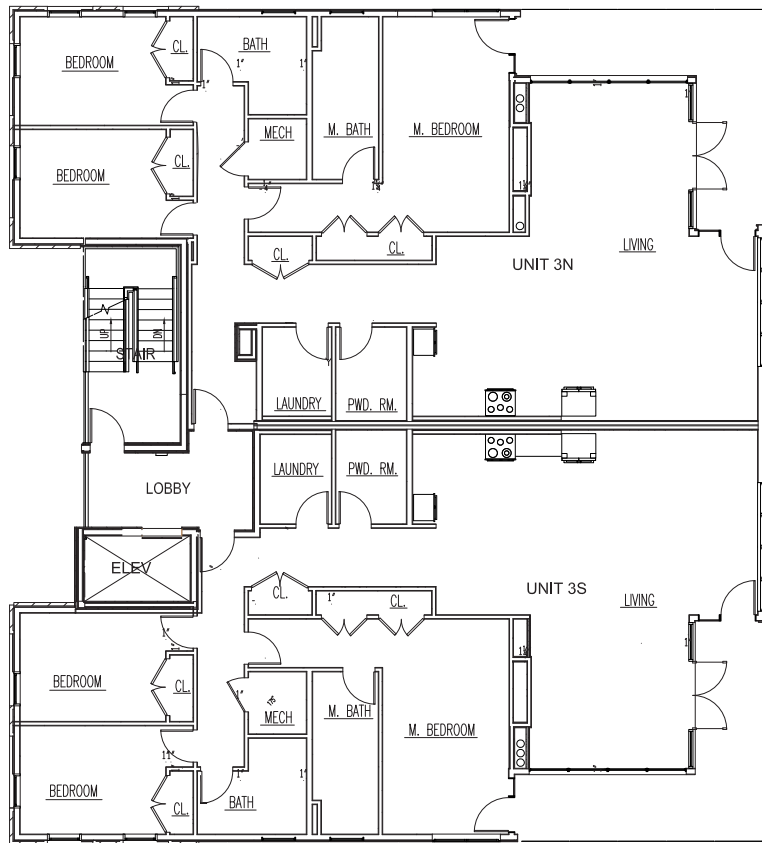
Typical floor plan for 2514 Dexter Ave N ("Plan Review No. 77554, Automatic Sprinkler System, 2514 Dexter Avenue North - Dexter Avenue Condominiums" 2021).
